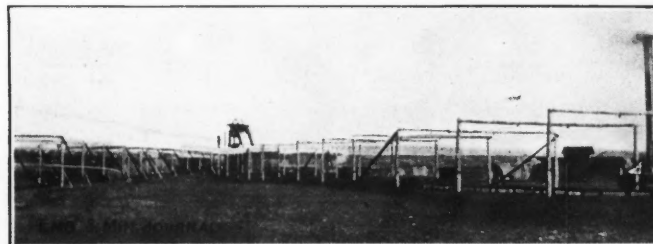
STOCKPILE TOP, SHOWING NEW TRACK LAYOUT
